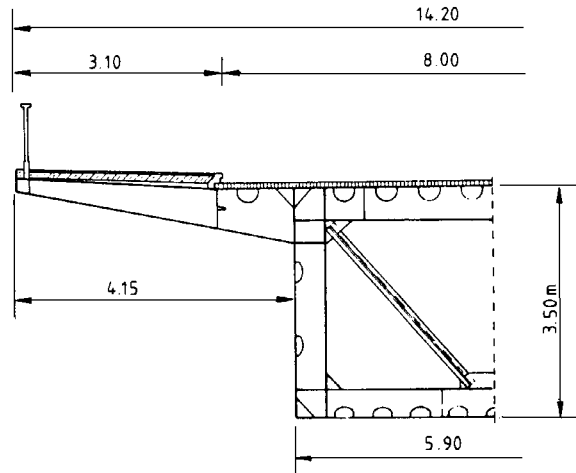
Orthotropic plate deck with closed section stringers (Weser-bridge Porta, Germany), [Dörmen, 1955].
